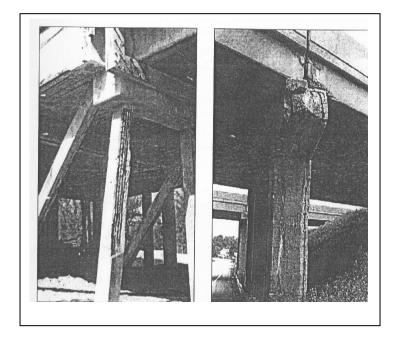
Chloride induced corrosion on a highway overpass. Note that cholorides have apparently run off of deck and onto this pier. Structural elements as well as decks should be protected.
